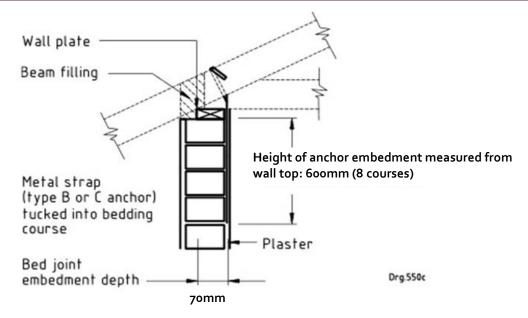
Truss anchoring Type B as per SANS 10400K for light roofs with a 15-30 degrees pitch.
